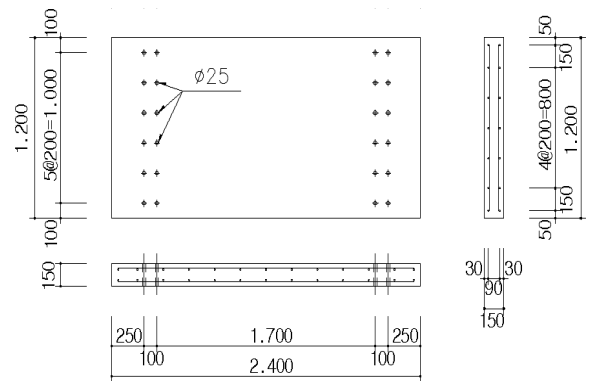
Dimensions and reinforcement details of slab (unit: mm)
